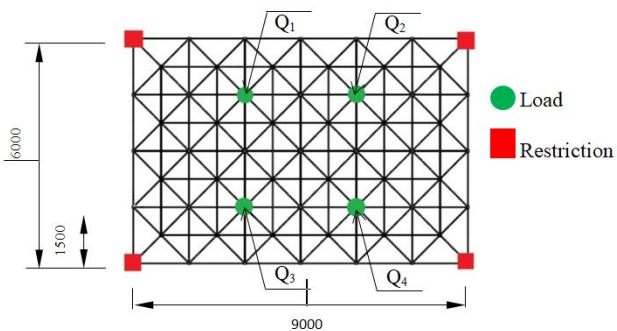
Top view of the prototype (Units in Millimeter) [1]
